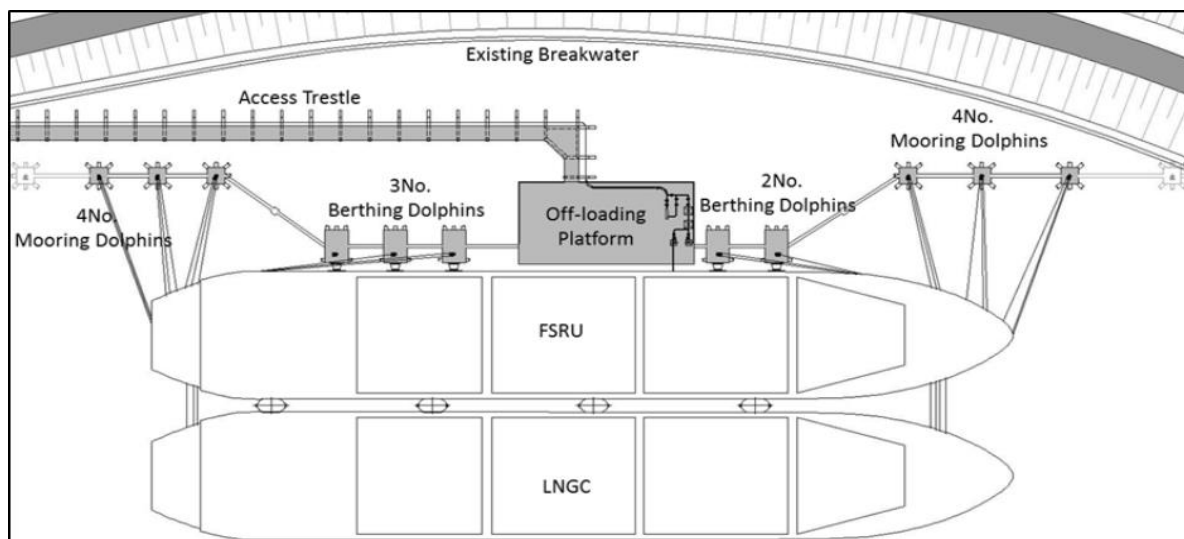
Layout 1 – Piled jetty structure (Source: (PRDW, 2016))
